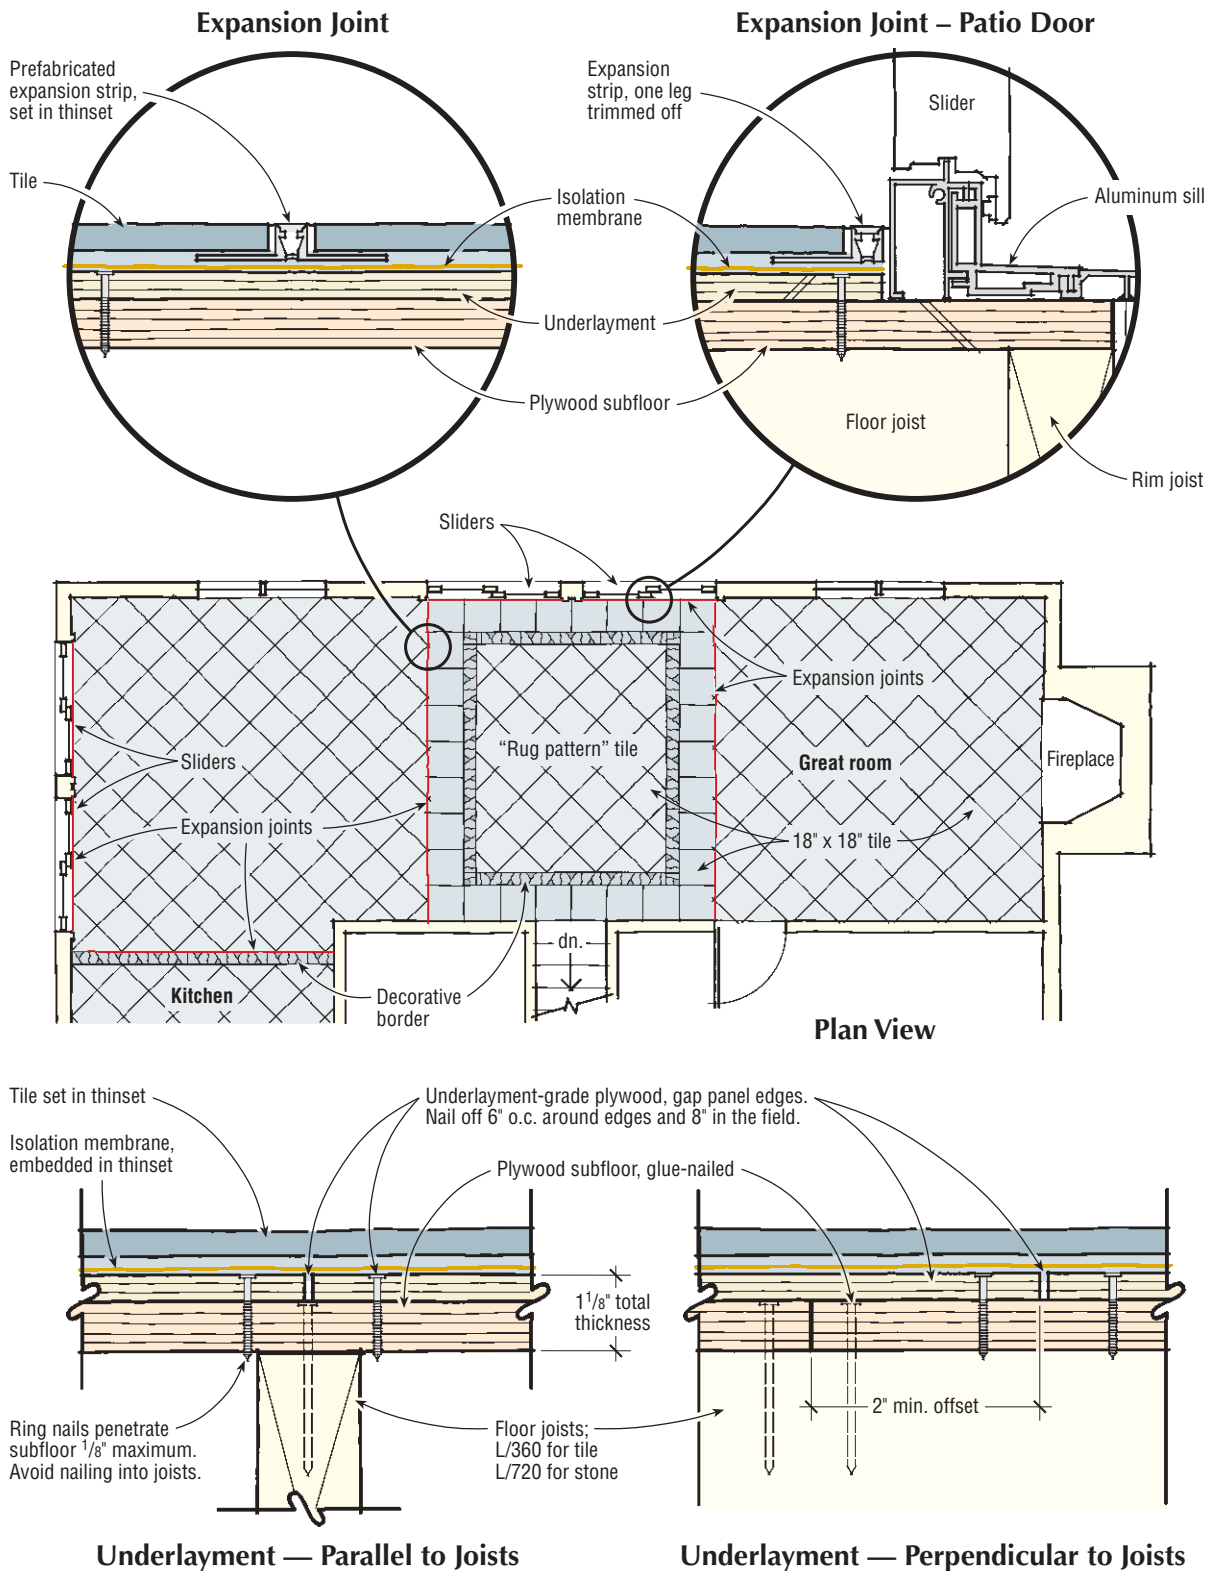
An uninterrupted expanse of floor tile is prone to stress cracking. Plastic expansion strips installed every 20 to 24 feet divide the field into smaller zones, minimizing cumulative movement and stress. Thermal movement at door thresholds cracks grout. It's a good idea to install an expansion strip there, too. A minimum 1 1/8-inch-thick plywood substrate and underlayment are required to limit deflection between framing members. Underlayment provides added stiffness and a disconnect between subfloor and framing movement. Proper panel layout, edge gapping, and nailing help ensure that the underlayment performs as intended.
